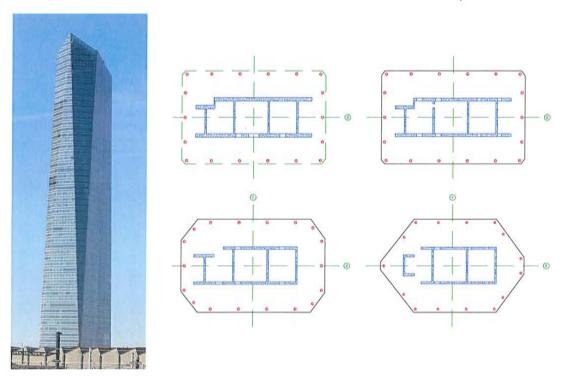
Torre de Cristal with typical floor plan at basement, low-, mid- and high-rise section
